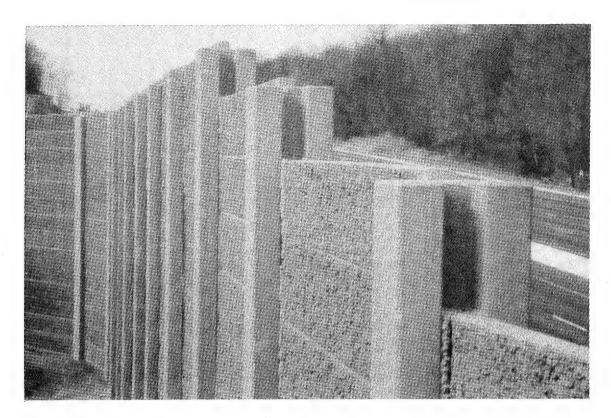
Precast I-shaped posts and panels used to form noise barrier wall along New Jersey Interstate Route 80 (from Guzaltan 1992)
